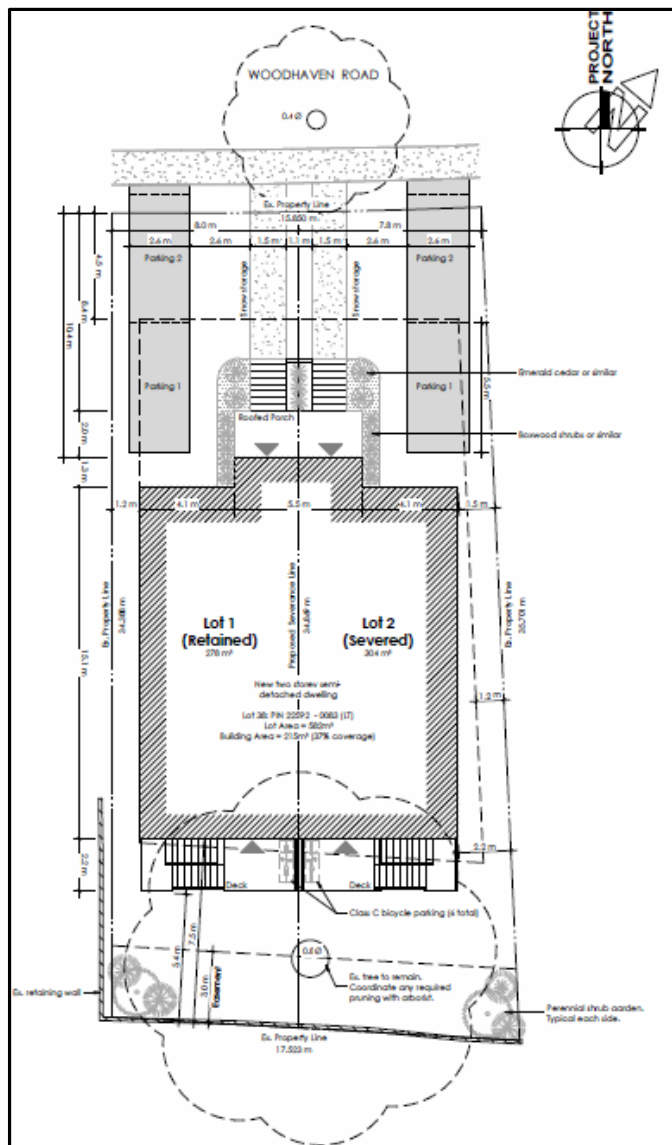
Proposed Site Plan of the Semi-Detached Dwelling
